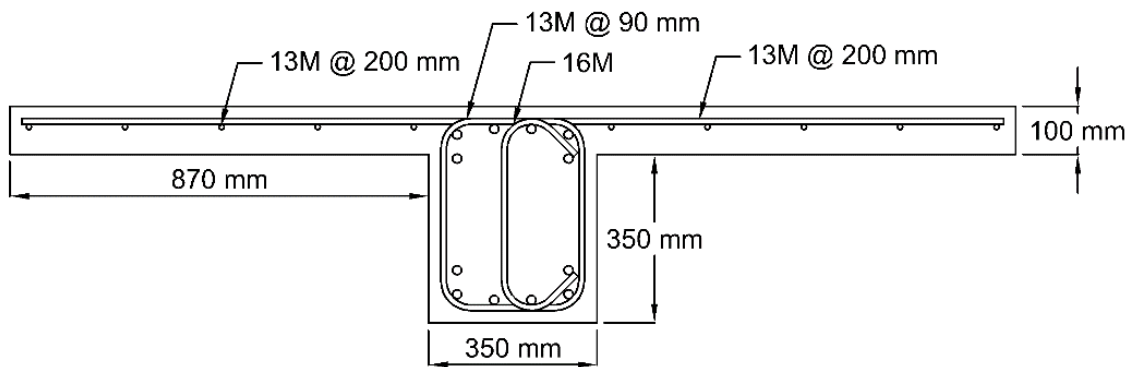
Reinforcement detailing of beams in GFRP-RC beam-column-slab specimen
